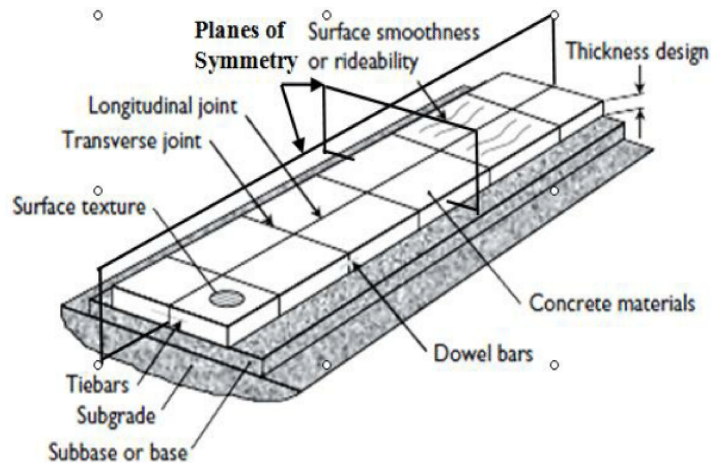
JPCP - Jointed Plain Concrete Pavement [GooglePhotos]
